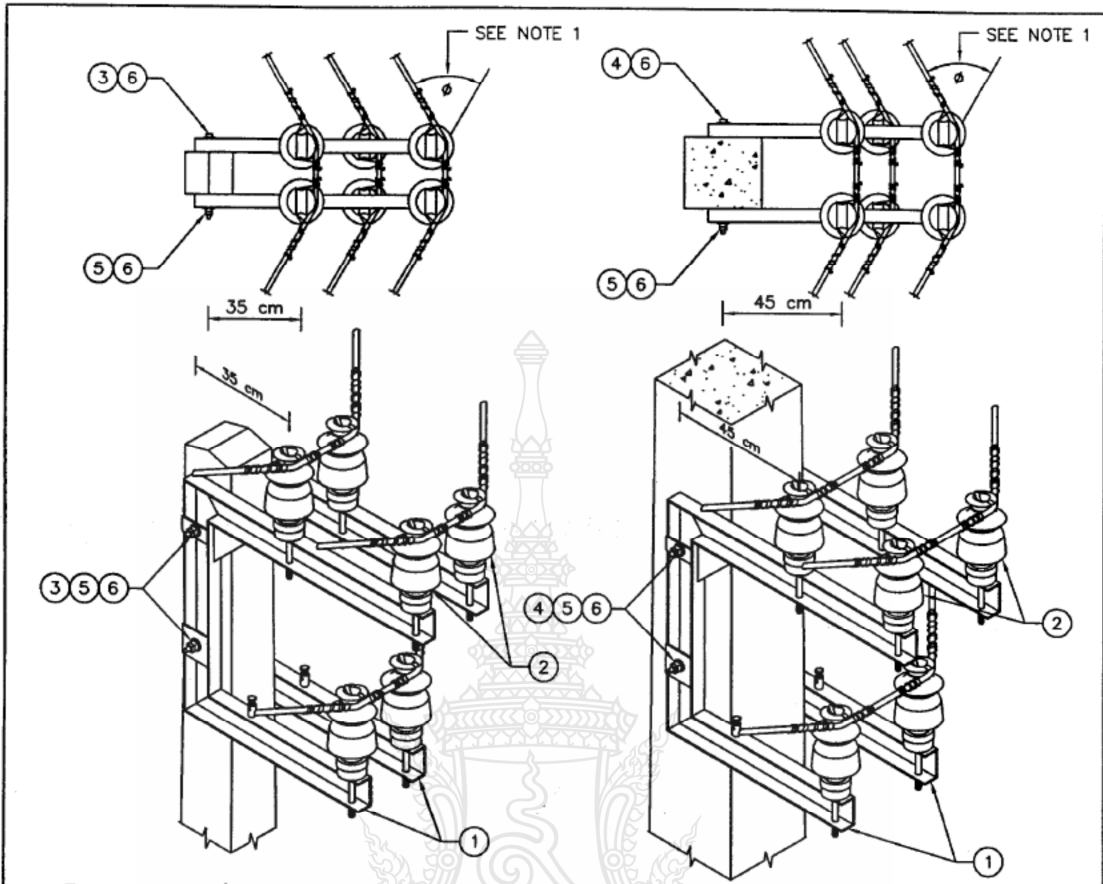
/12.35 m CONCRETE POLE      FIG.B FOR 20/22 m CONCRETE POLE
